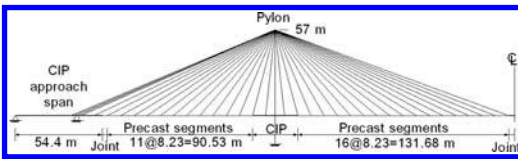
Half elevation of Pasco-Kennewick inter-city bridge.
